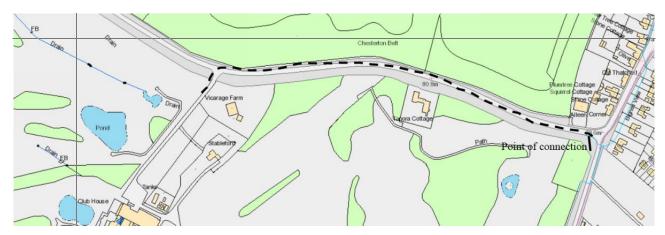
Proposed Point of Connection to Existing Mains Water Infrastructure.
